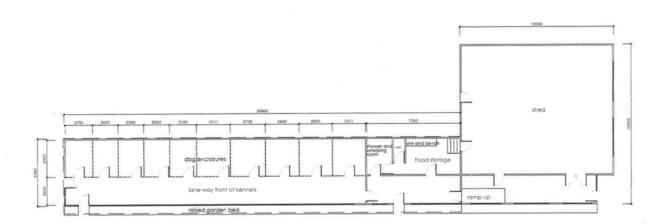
Floor Plans of building to be used for Animal Husbandry.
